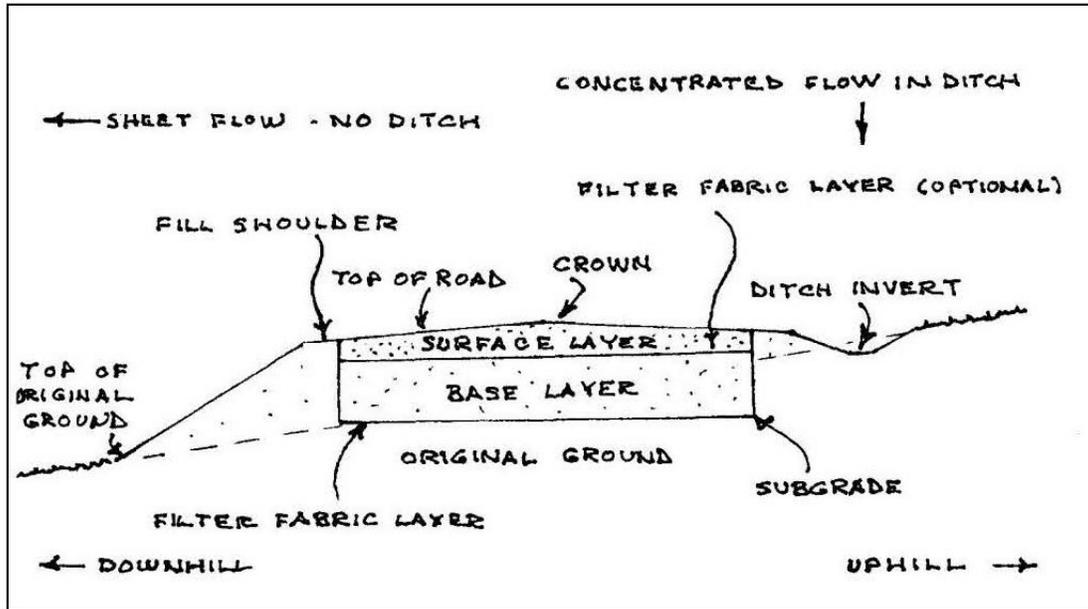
Typical Road Cross-Section – Canaan, NH Highway Department
